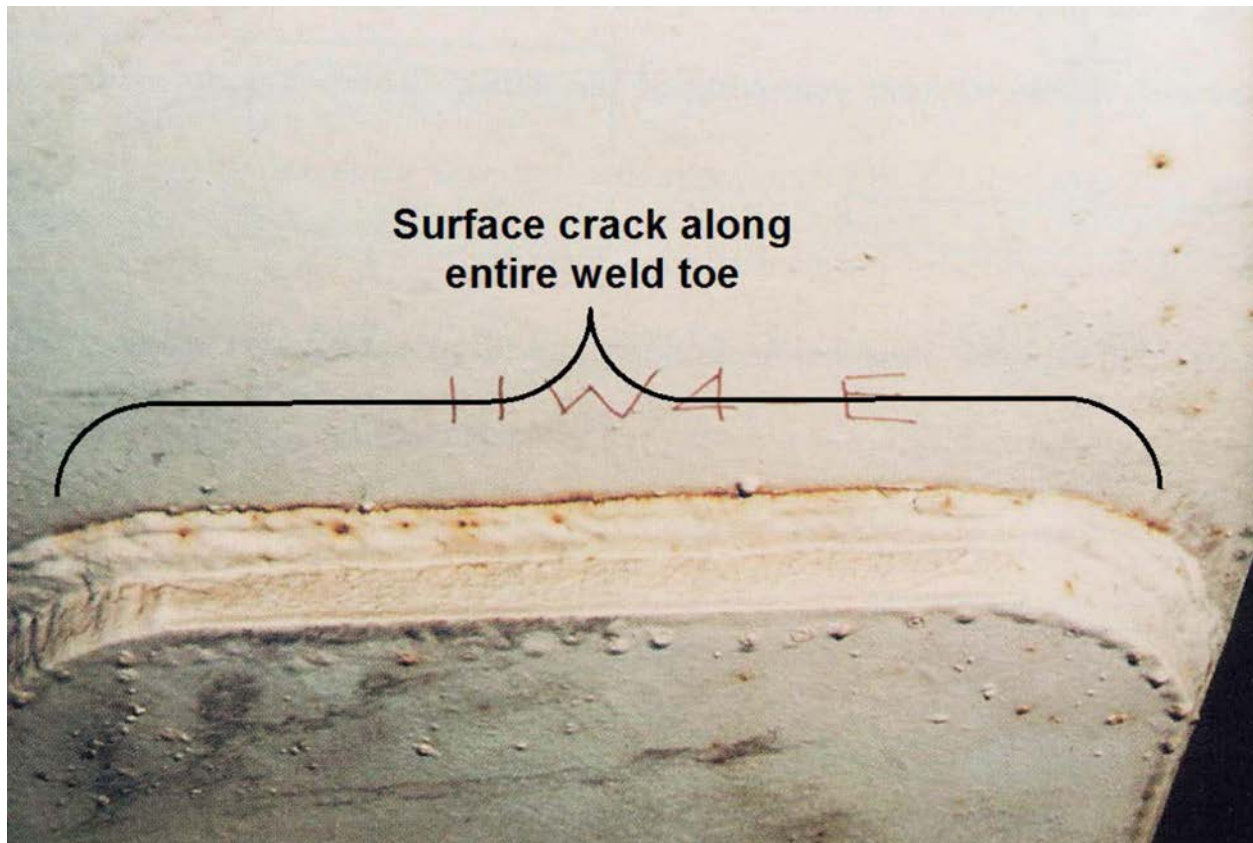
Cracking of a cover plate on the Yellow Mill Pond Bridge.
